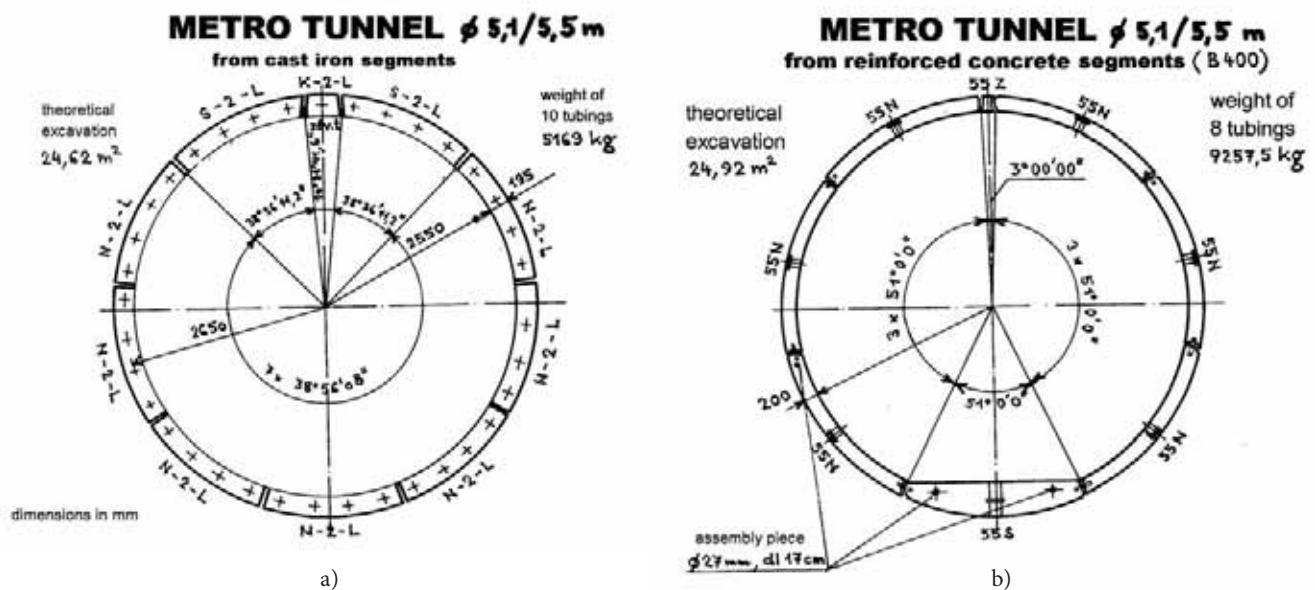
Cross-section of the tunnel with a) cast-iron segment b) concrete segment [3].
